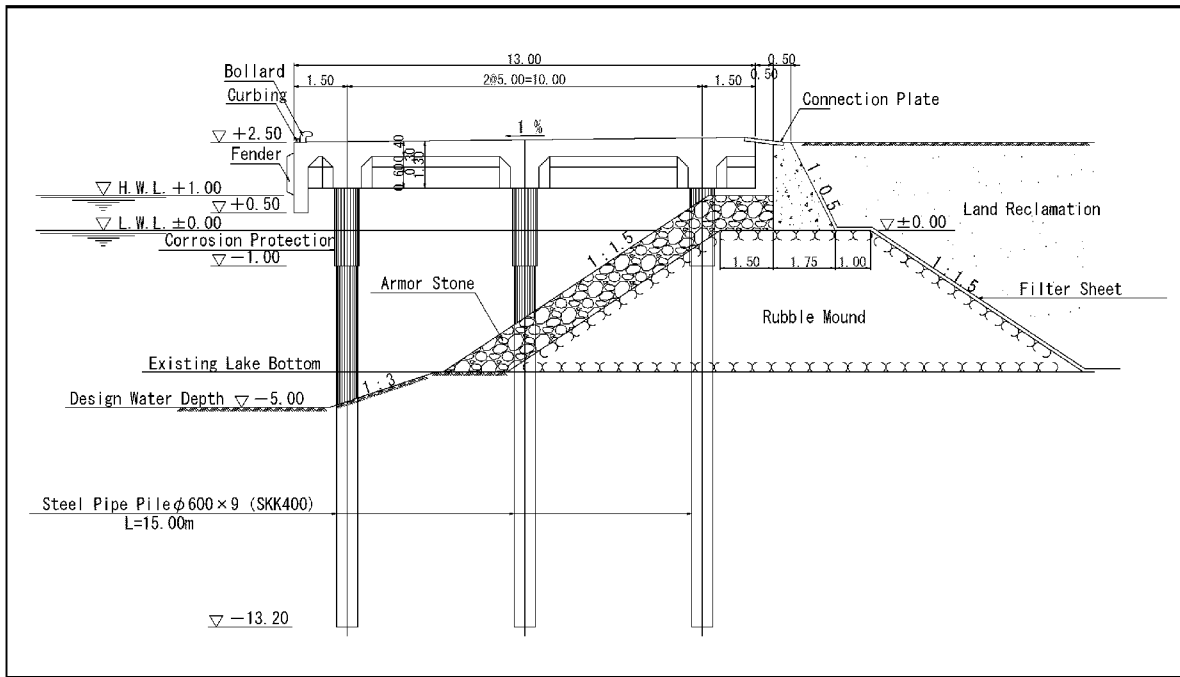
Comparative Cross Section of Pipe Pile Type Open Structure
